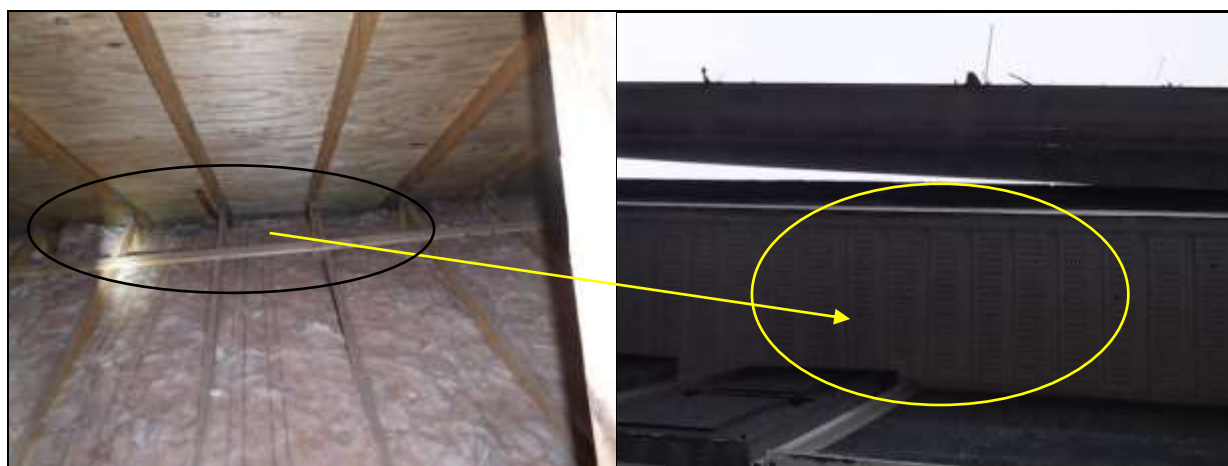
Insulation blocking perforated soffits; no air flow. Hot humid attic shortens life of roof and promotes mold like growth and potentially damage roof structure.
